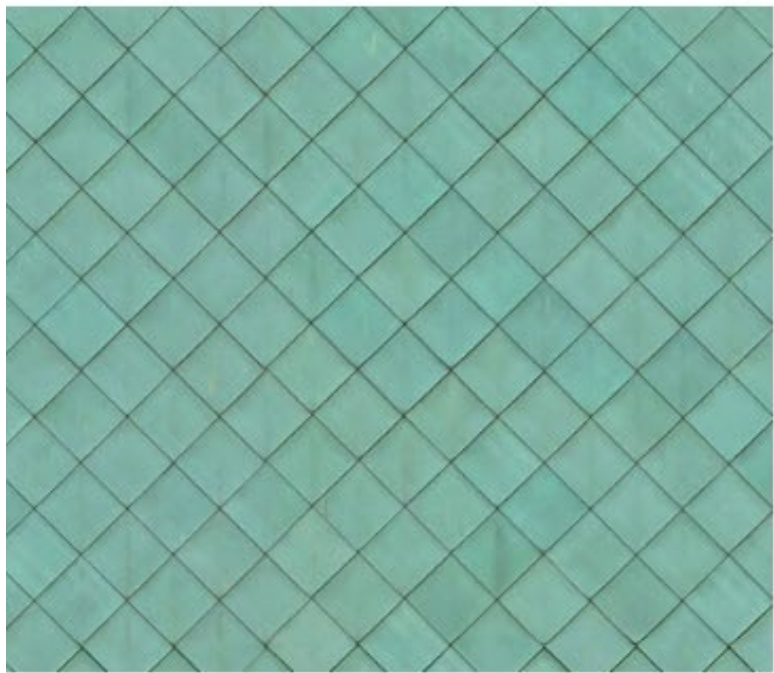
Proposed Roof Material - Pre-Patinated Copper Diamond Shape Shingles
